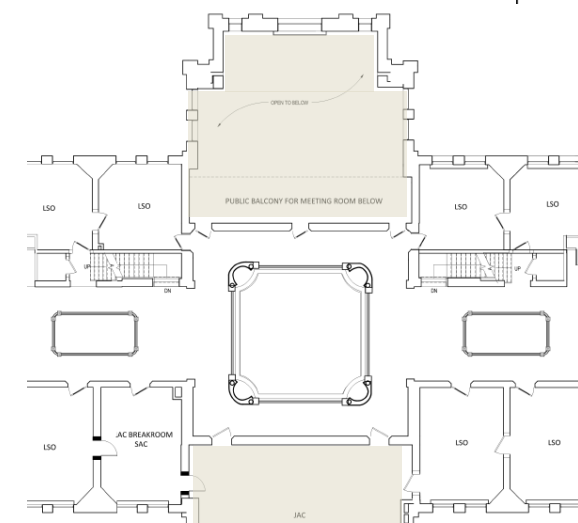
Third Floor Meeting Room Balcony and JAC to the South
